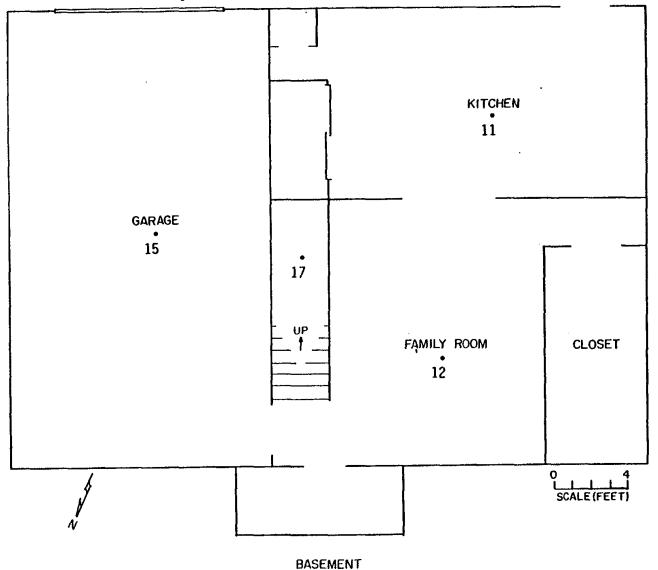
Schematic of the first level floor plan at 460 Davison Avenue showing external gamma-ray measurement results ($\mu R/h$).
